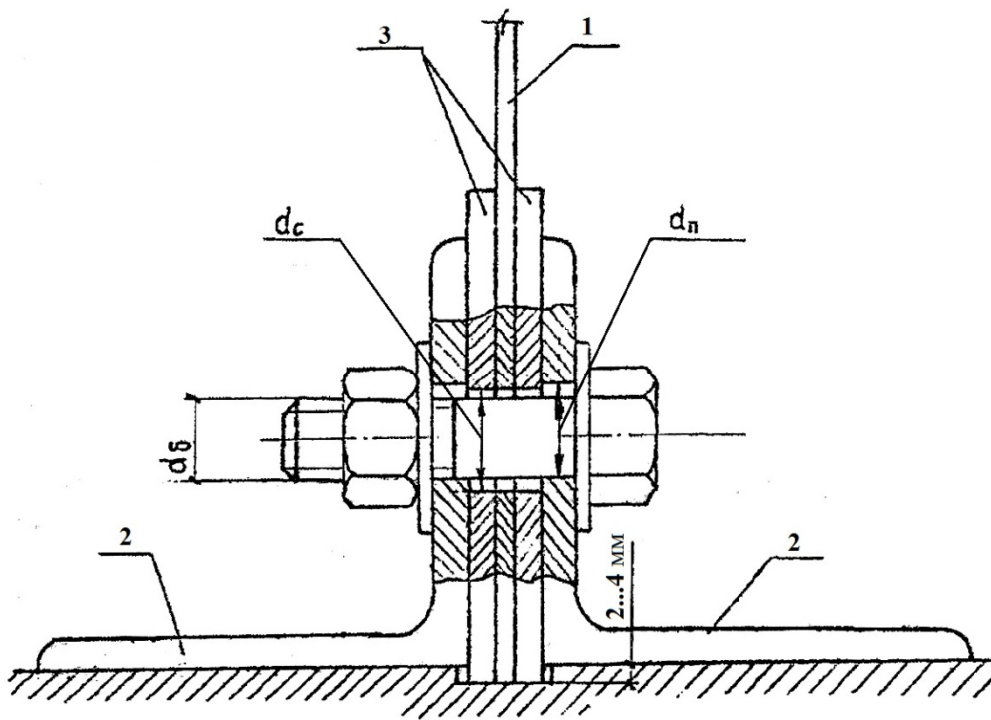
Beam with goffered wall: 1 – goffered wall; 2 – upper waist belt; 3 – connecting details
